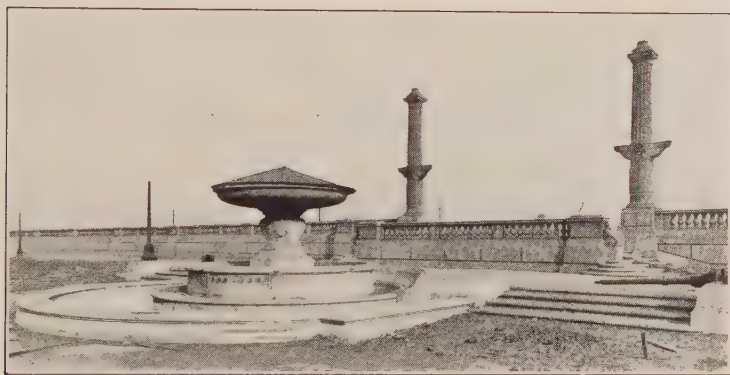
VIEW OF THE WALL, BALUSTRADE, STEPS AND TERMINAL FOUNTAIN.
